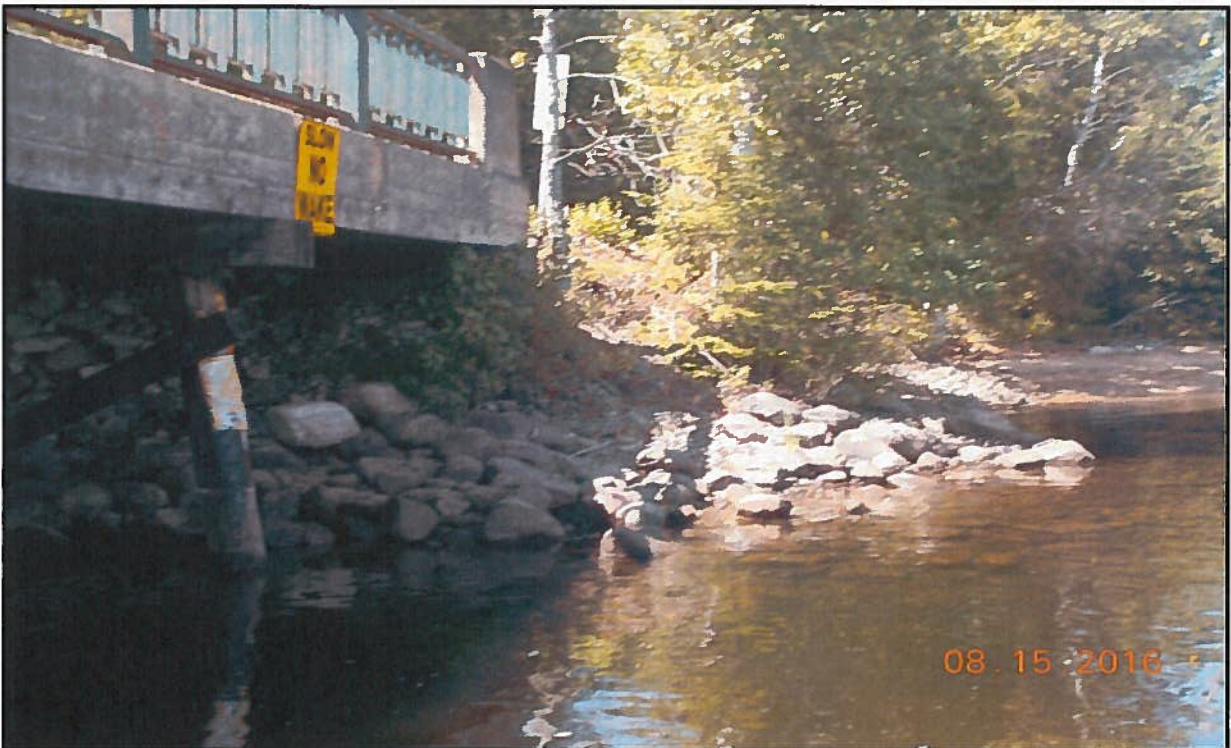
Erosion of Embankment - Northwest Quadrant Looking West
